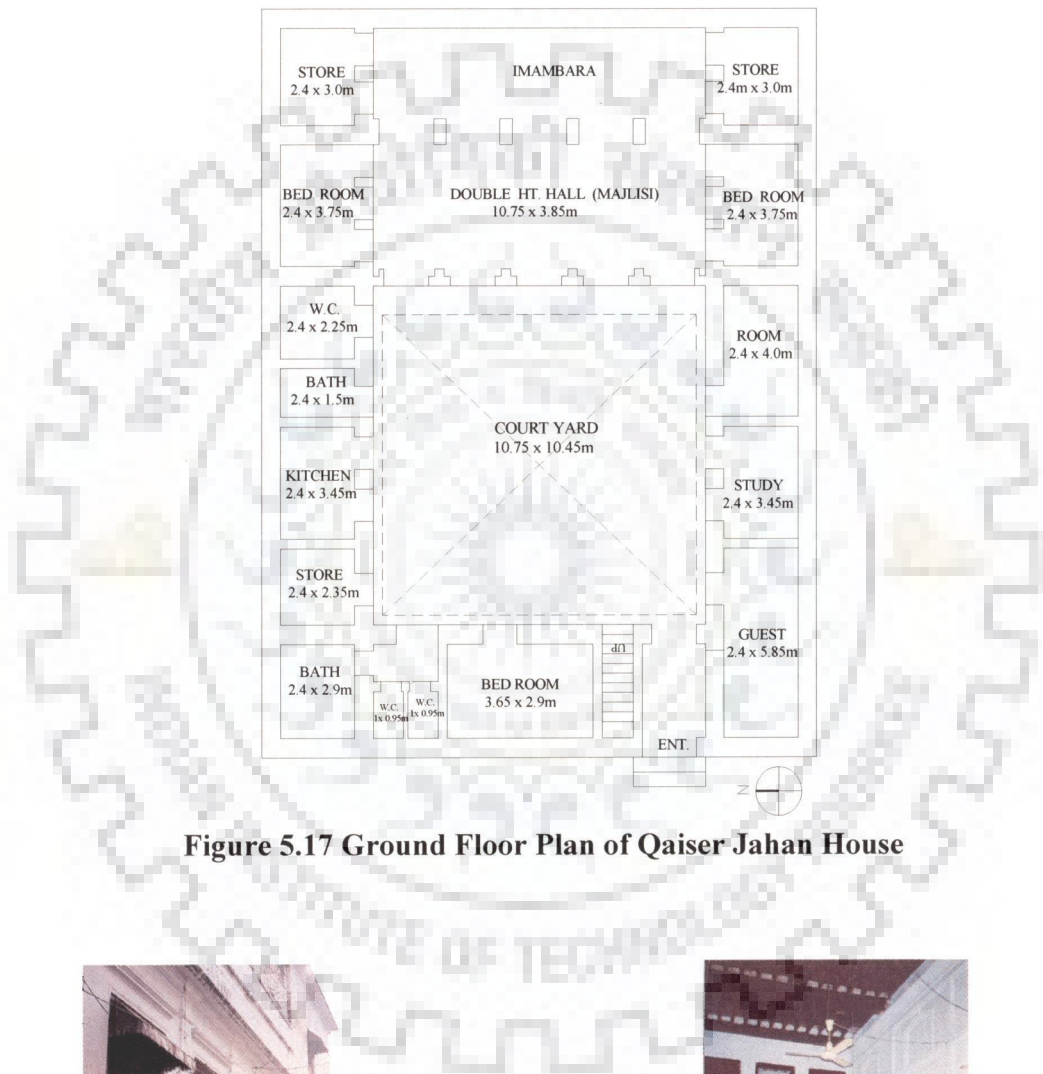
Ground Floor Plan of Qaiser Jahan House
